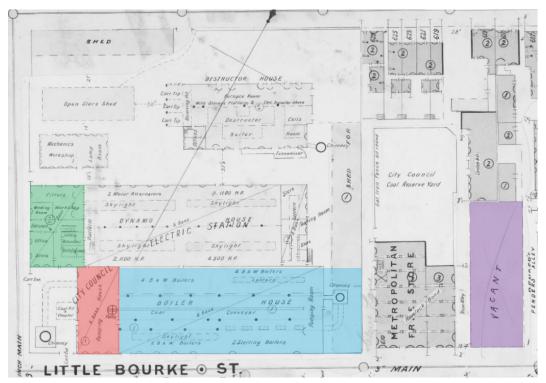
Detail from a 1910 fire survey plan shows the Pumping House (Economiser building, shaded red) and the Offices fronting Spencer Street (shaded green). The 620-648 Little Bourke Street site (shaded blue) was occupied by the 1903 Boiler House and an attached iron shed to east, and the 602-606 Little Bourke Street site was vacant (shaded purple). (Source: Mahlstedt Map Section 1, no 22, 1910)
